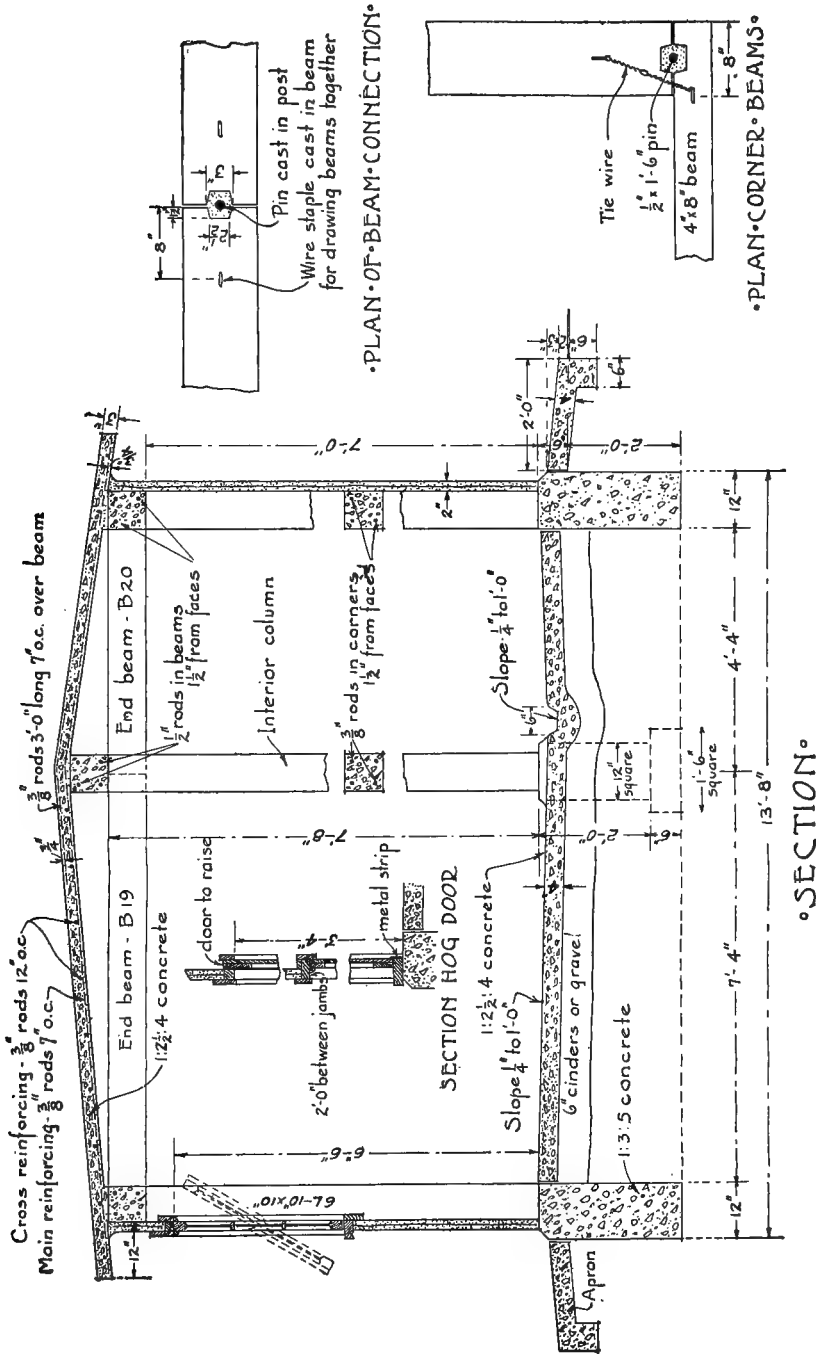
Detailed Sectional Views of Cement Plaster Hog House. The arrangement of columns and beams is clearly shown in this illustration.
